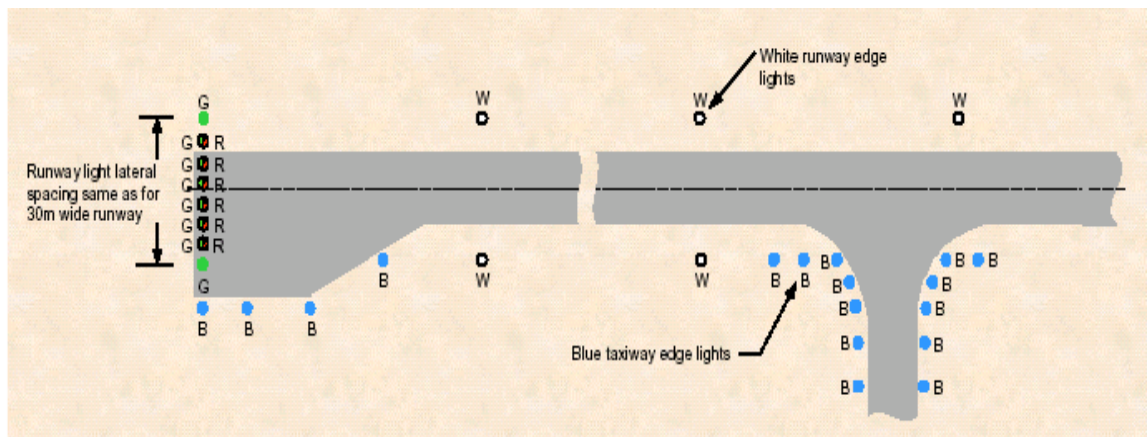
Typical Light Layout Where Runway Pavement is 23 m or 18 m wide
